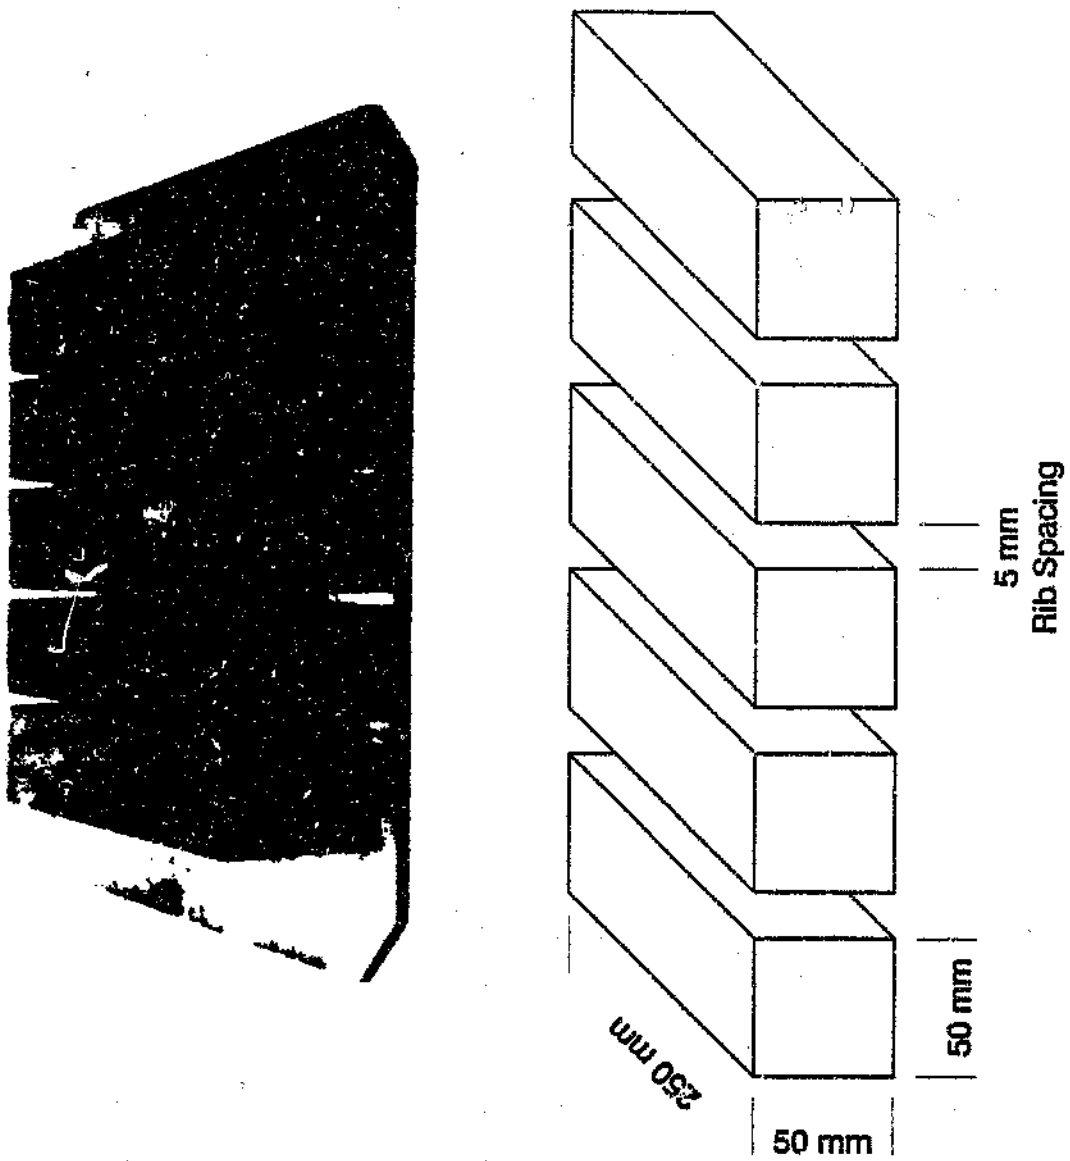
Layout of separated cemented backfill rib arrangement for compression testing.
